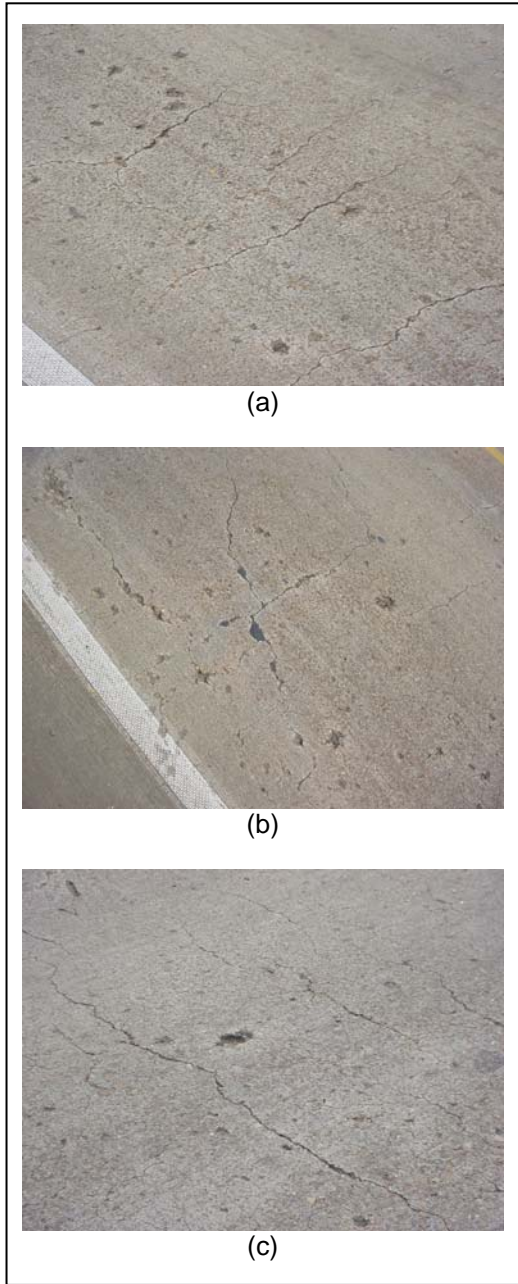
Cracking on road deck due to thermal expansion and contraction
